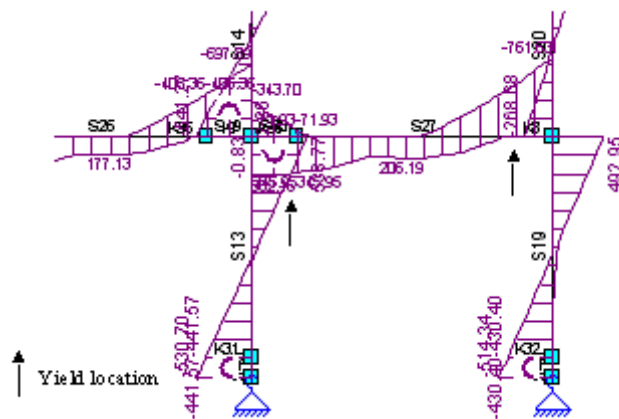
Bending moment diagram and yield locations at the first floor.
